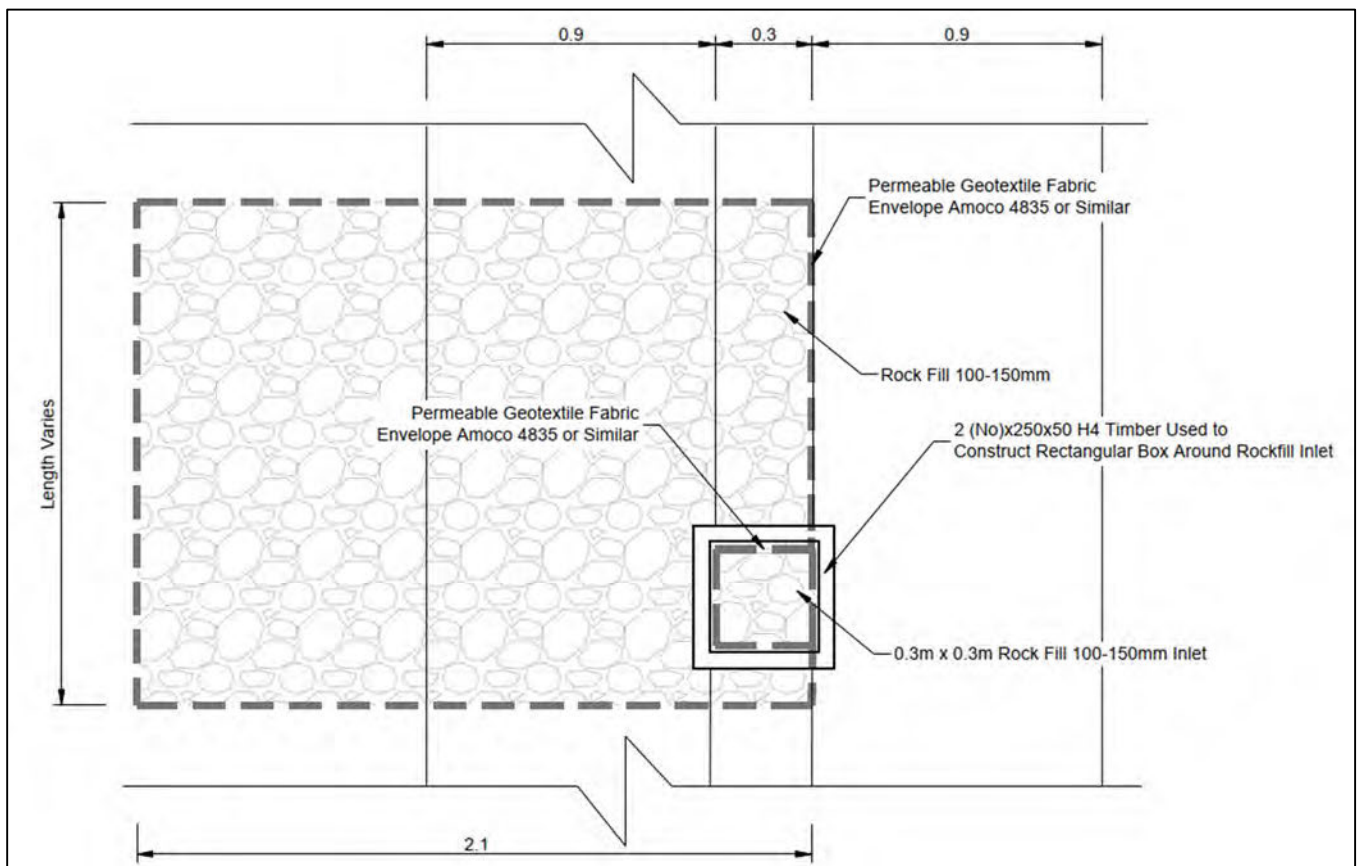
Soak Pit for Roads - Rock filled (Plan View)
